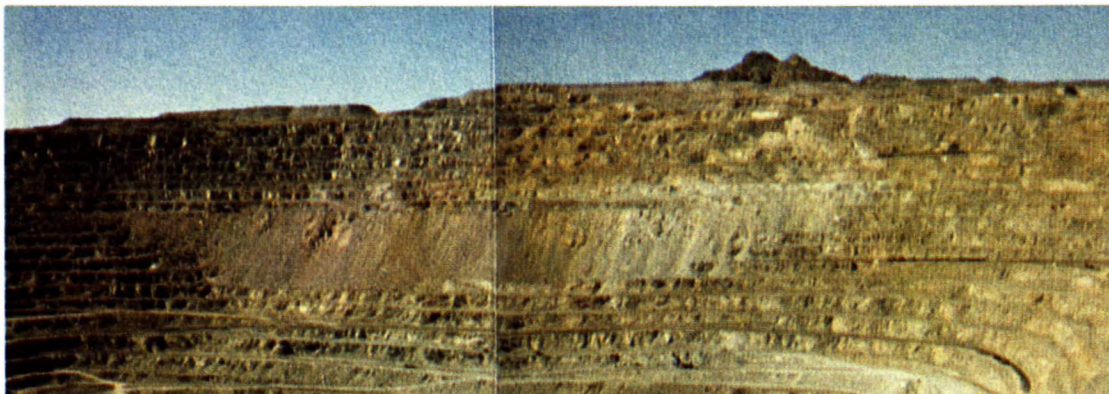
Stripping back an 800 ft (244 m) wall to eliminate further instability.
